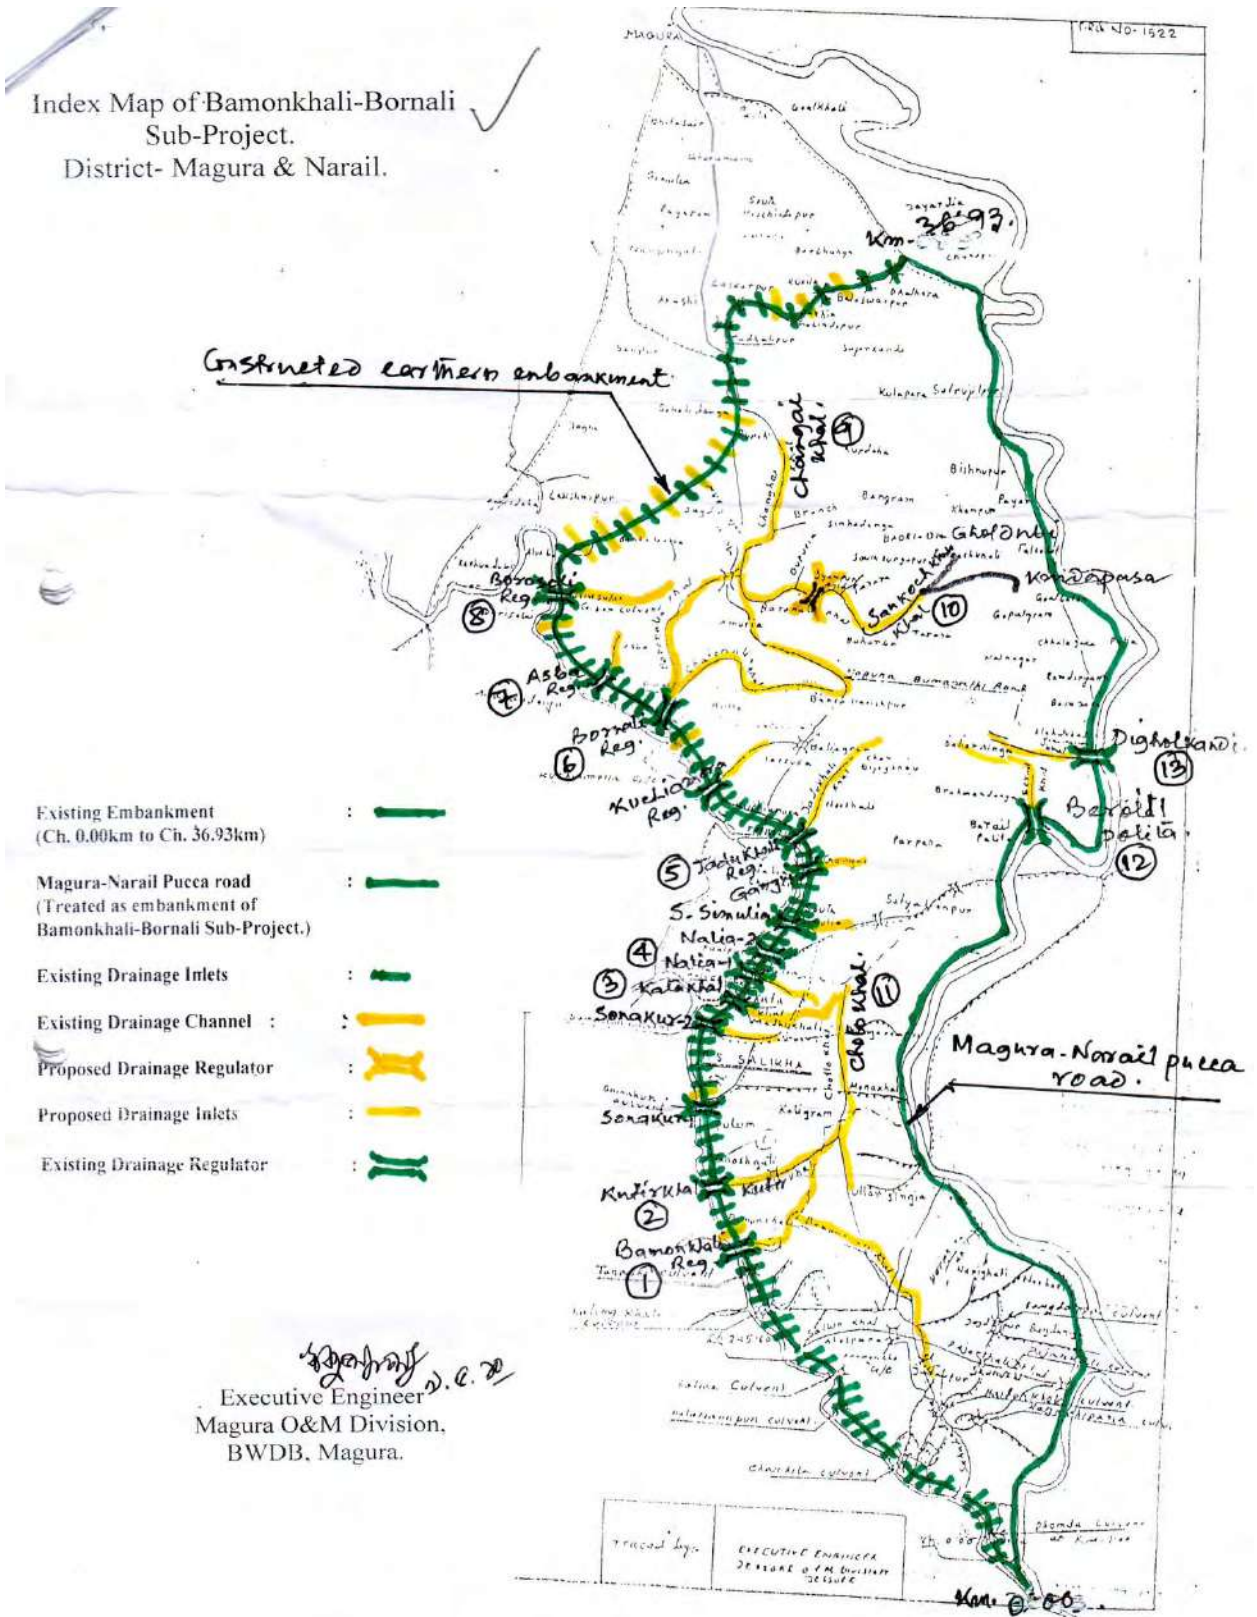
Existing infrastructure and proposed intervention along with topography of Bamonkhali-Barnali Subproject
